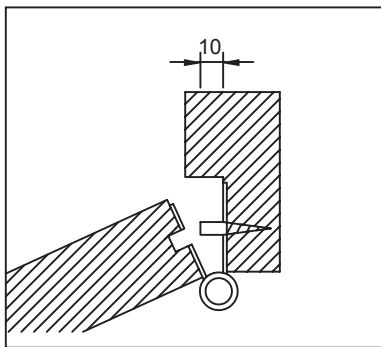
TOLERANCE BETWEEN DOOR AND FRAME
